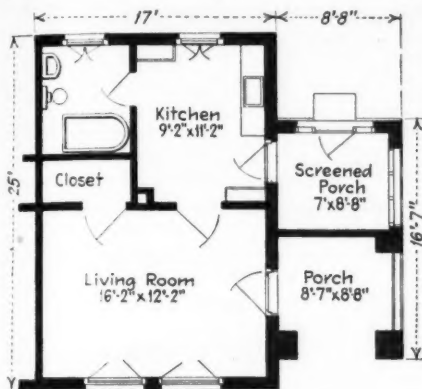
Half of double house having two two-room apartments, American employees, Tyrone, New Mexico
